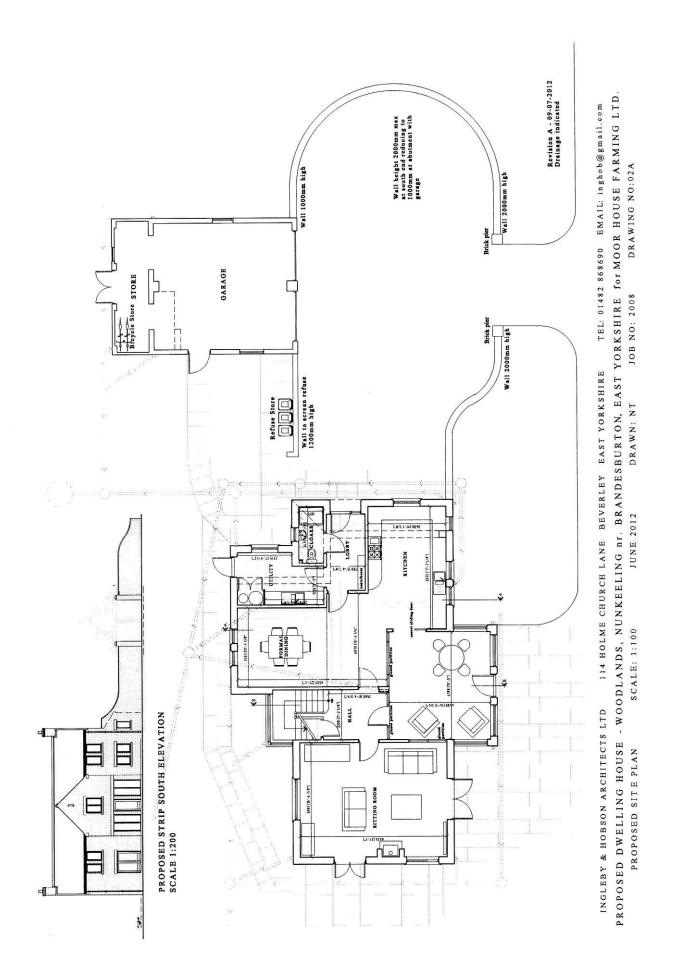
PROPOSED SITE PLAN (not to scale - plan supplied by Ingleby & Hobson Architects Ltd)
